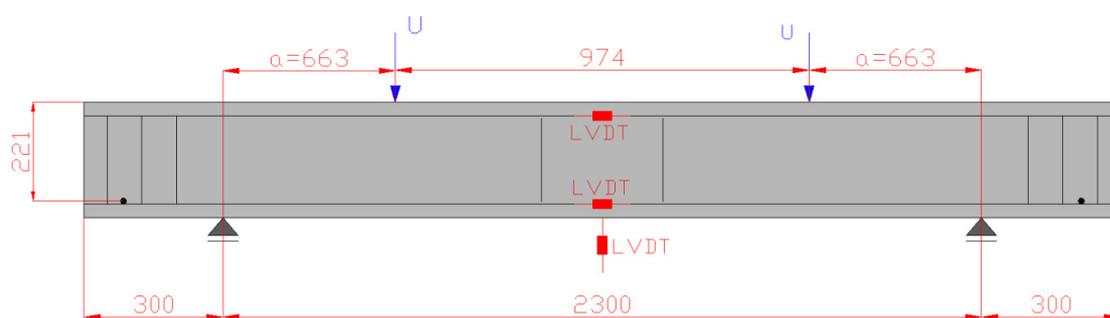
Sketch of load placing and placing of LVDT's during laboratory testing on shear beams.
